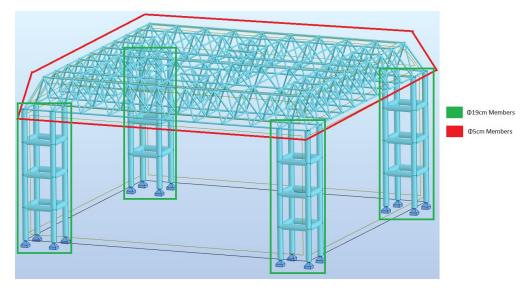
Structure Model with 19 cm Diameter Members for Columns and 5 cm for Truss Members
